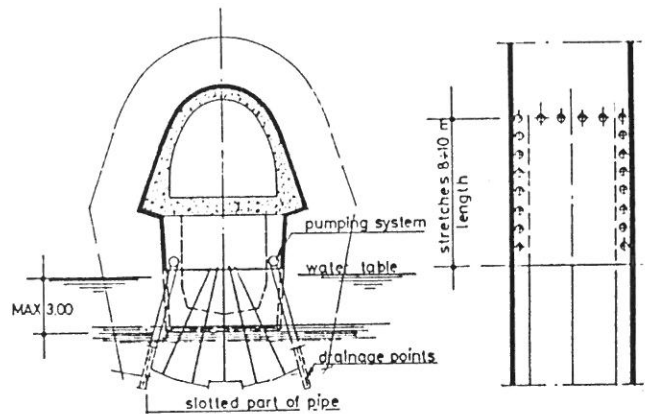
Attempt to protect excavation by additional grouting and drainage
